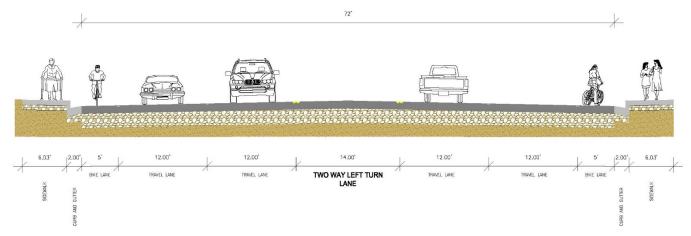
Proposed Eagle Canyon Drive Widening Section
